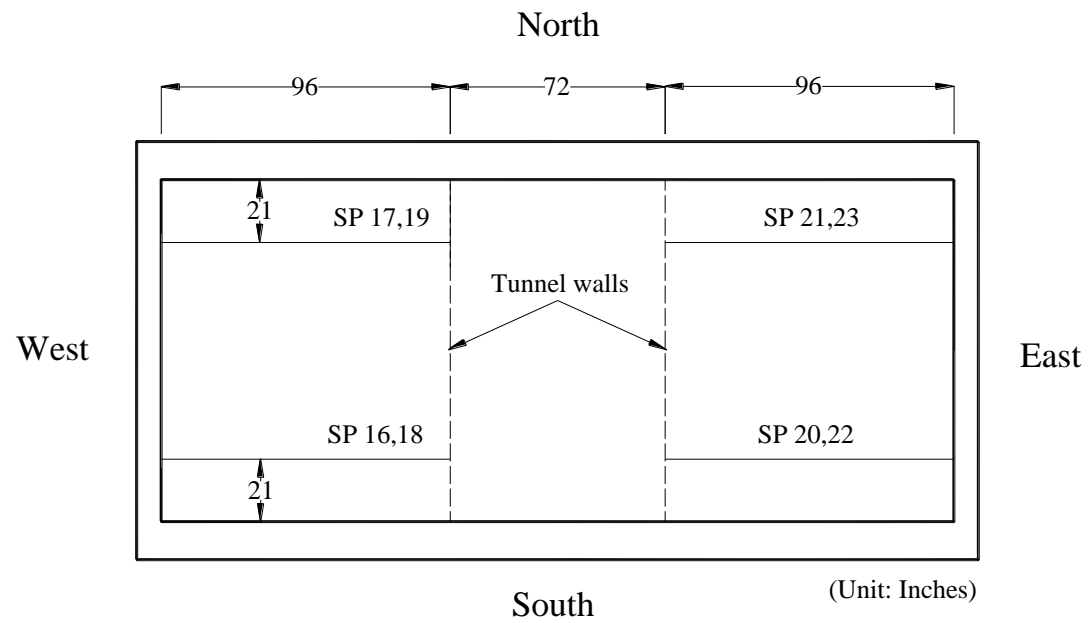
Elevation view of string potentiometer (SP) layout to measure translation of the tunnel relative to the laminar frames
